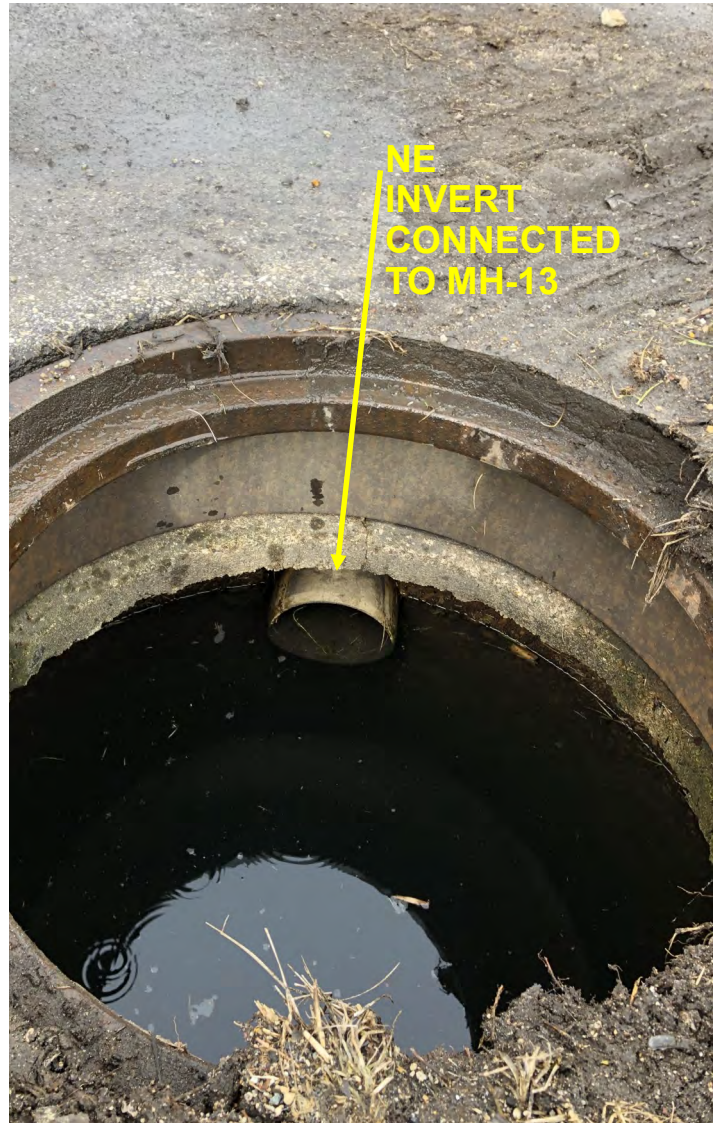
Manhole MH-16 interior with visible NE invert connected to manhole MH-13 and high water level. View to northeast; photograph taken on April 7, 2022.
